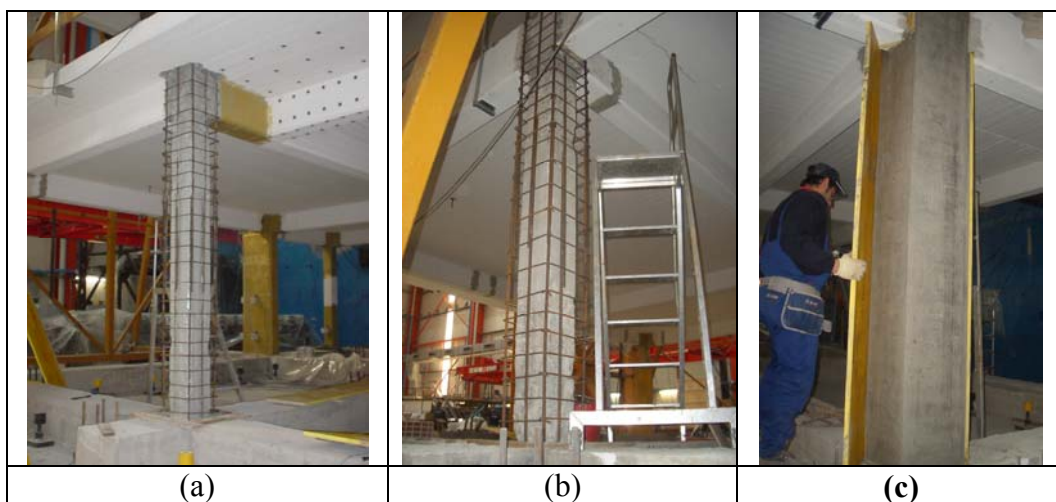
Longitudinal and transverse reinforcement of column C4 (a) and C1 (b); RC jacketed column (c)
